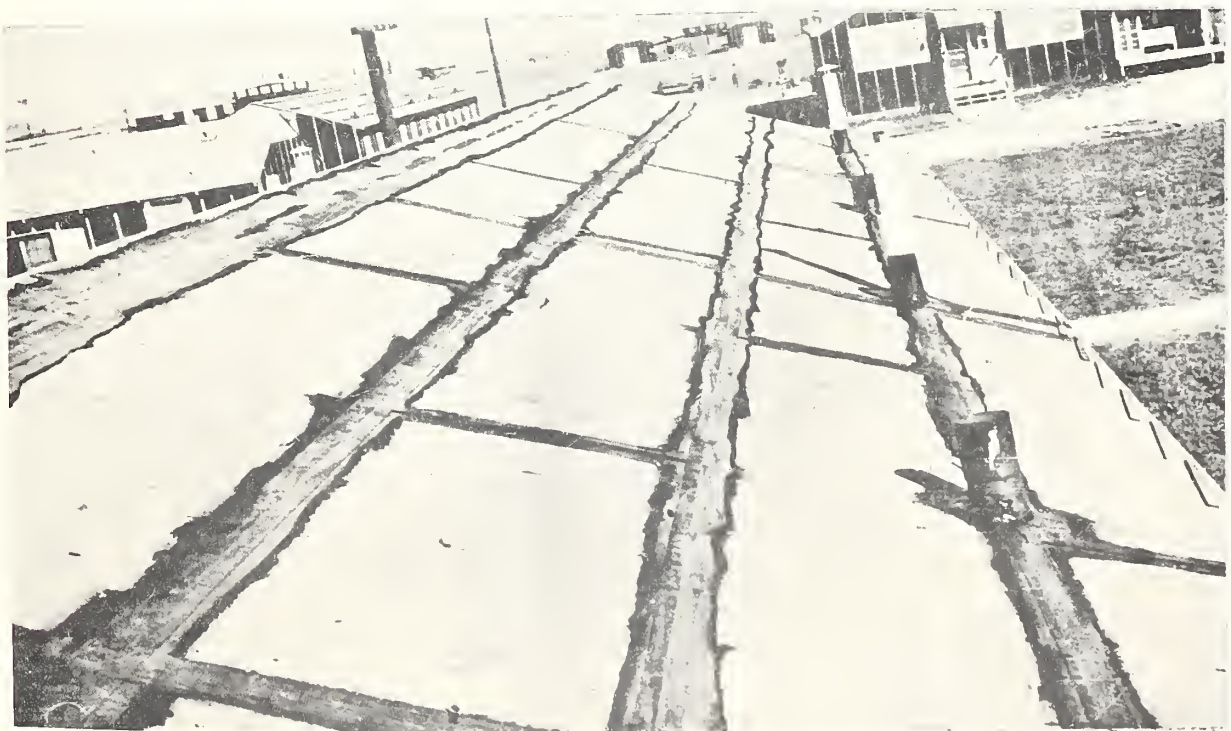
Seams of roll roofing repaired with asphalt saturated fabric and asphalt roof coating (Method I).
